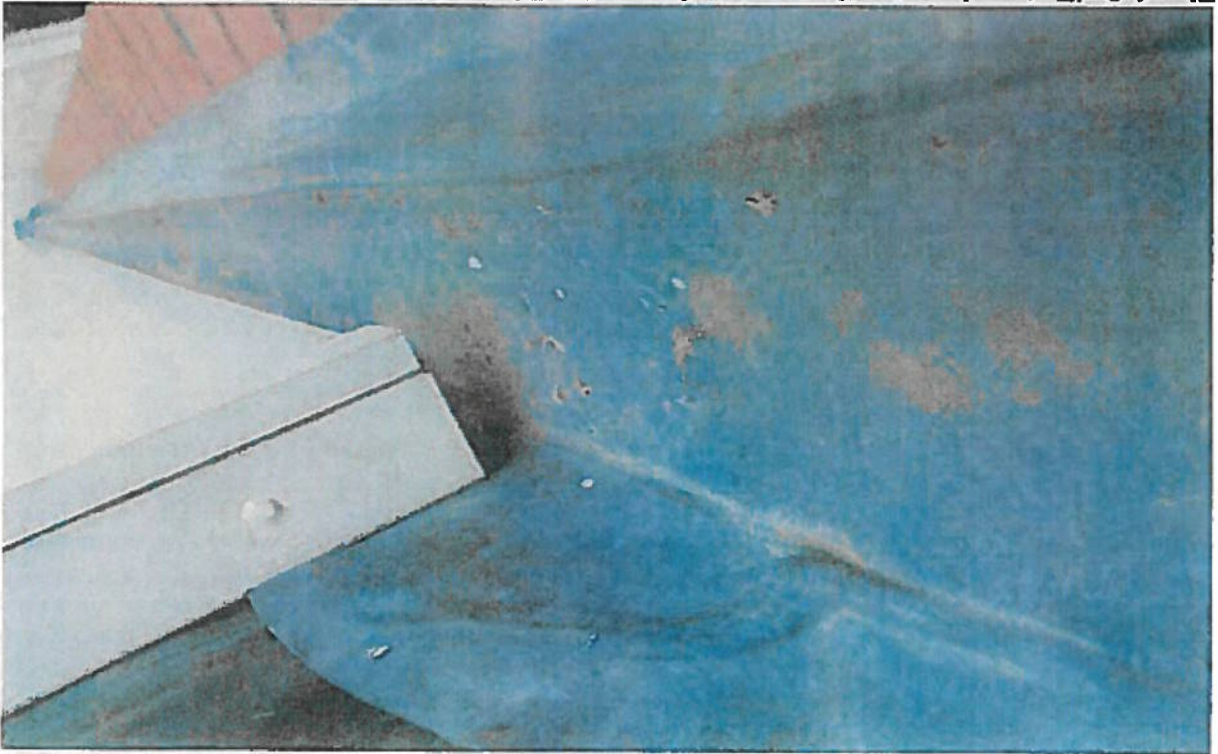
(Extension to the rear of no. 18 Riverside Grove, which has been constructed on the rear boundary / party wall between no. 17 and no. 18, photo taken on the 5th October 2017)
